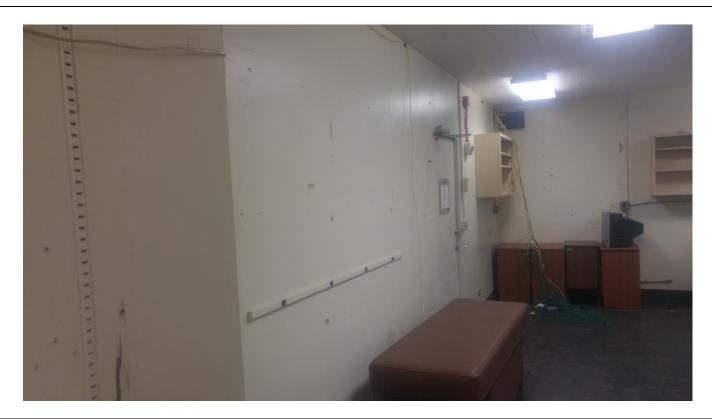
April 26, 2018 Project Site: Young Building - First Floor – Leahi Hospital, Honolulu, Hawaii Description: Asbestos-containing gypsum wallboard and mud in existing storage. Client: CKM Architects, LLC.
